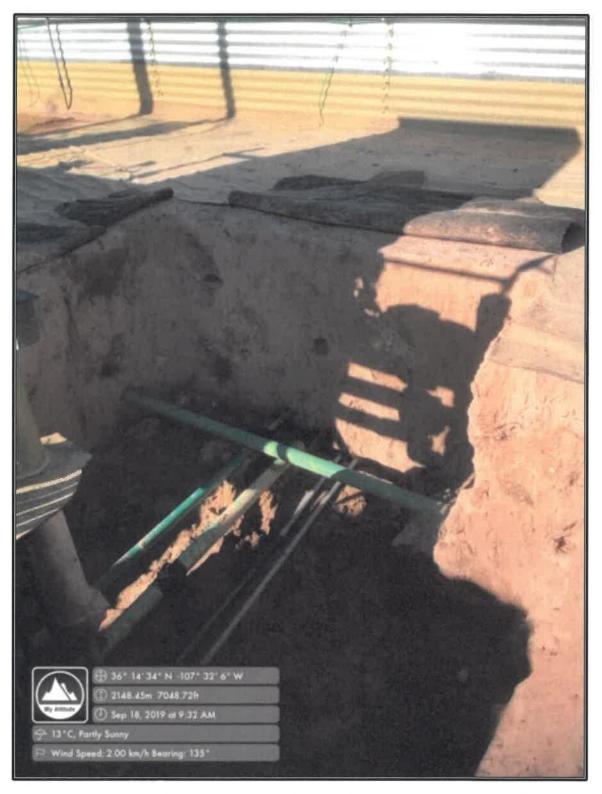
Excavated Area on 9/18/2019 (View of West Wall)
